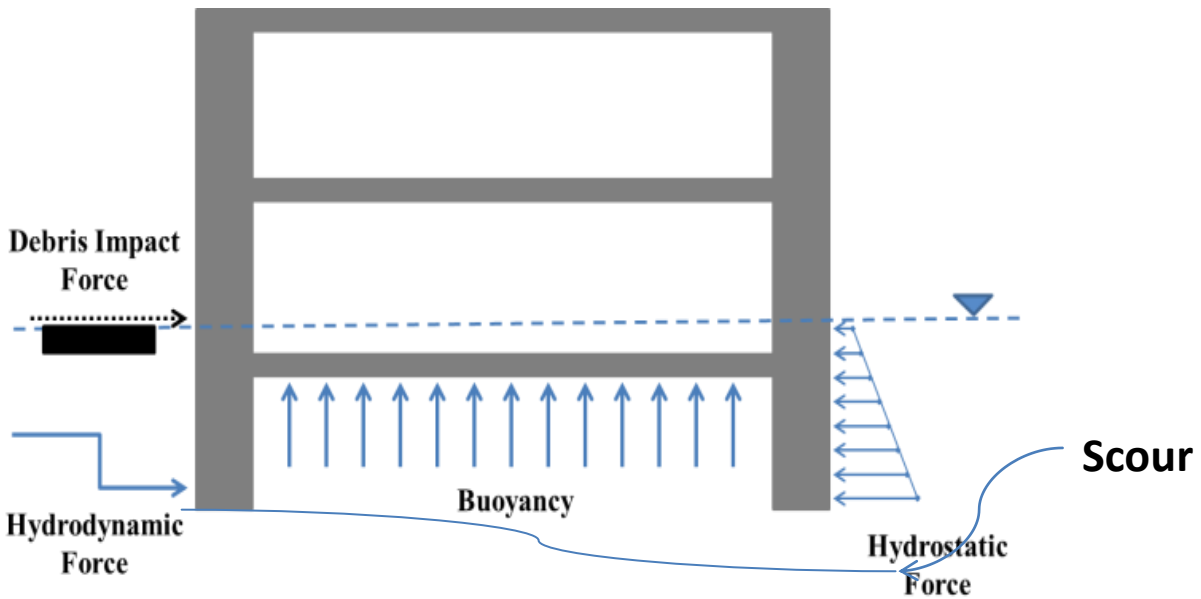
Illustration of forces acting on a typical structure subjected to storm surge and scour.
